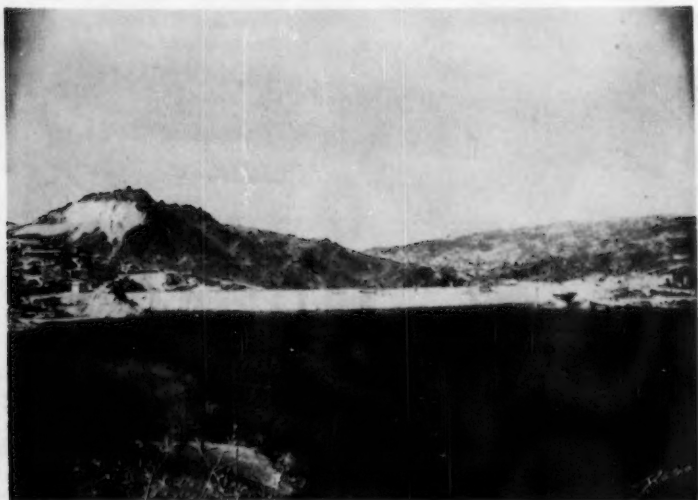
GENERAL VIEW LOOKING DOWNSTREAM.
